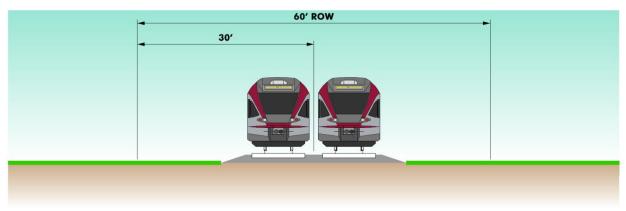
Regional Rail Typical Section on Common Segment – East of Chestnut Avenue – Kessler Park Proposed Excavation
